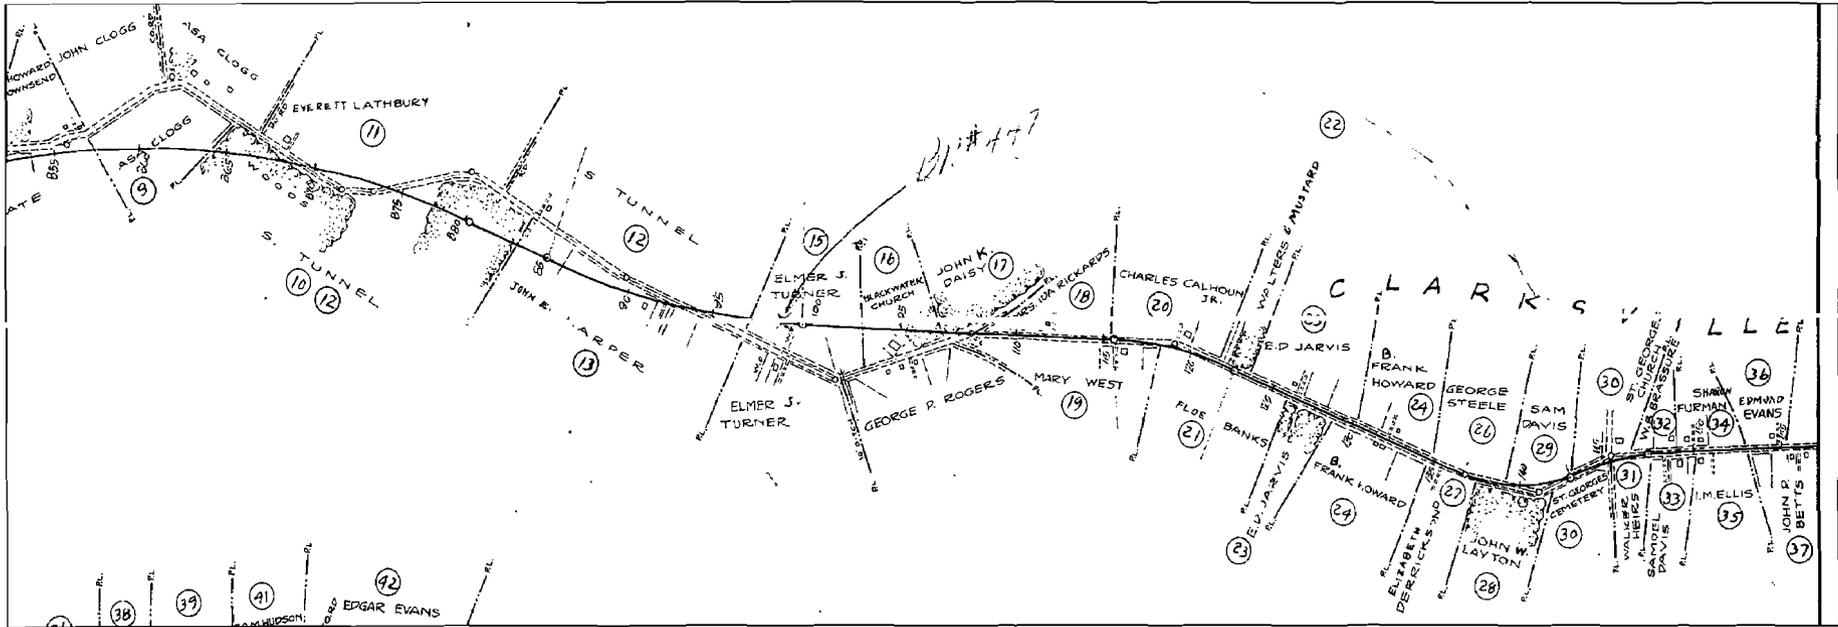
Road Improvement Plans, County Road from Omar to Clarksville, Detail of Bridge 447 Area (Delaware State Highway Department 1924)
